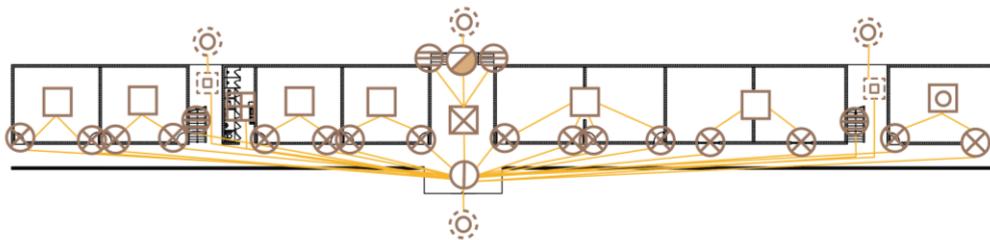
1st floor plan of NauHua Elementary School in Taiwan
